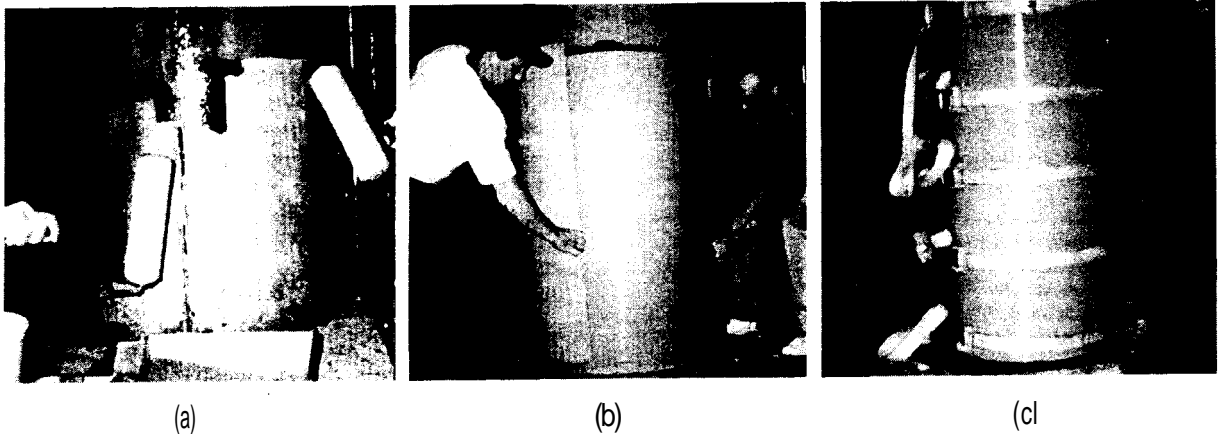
Installation of Prefabricated Composite Jackets: (a) Applying Adhesive to Column Surface; (b) Installation of Jackets; (c) Curing of Adhesive
